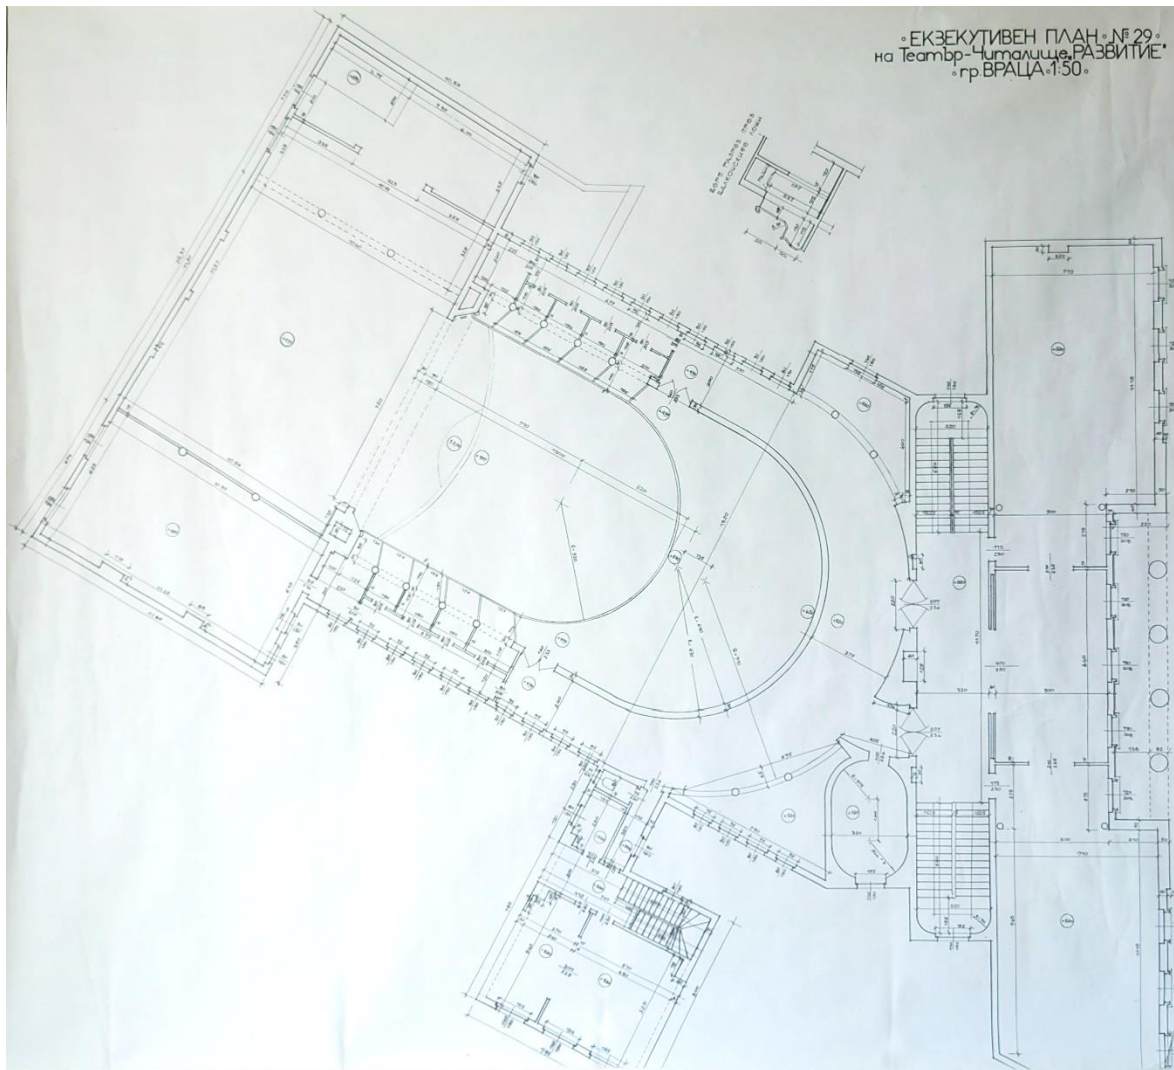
Second floor plan (above the ground floor) of the Razvitie Community Centre.
